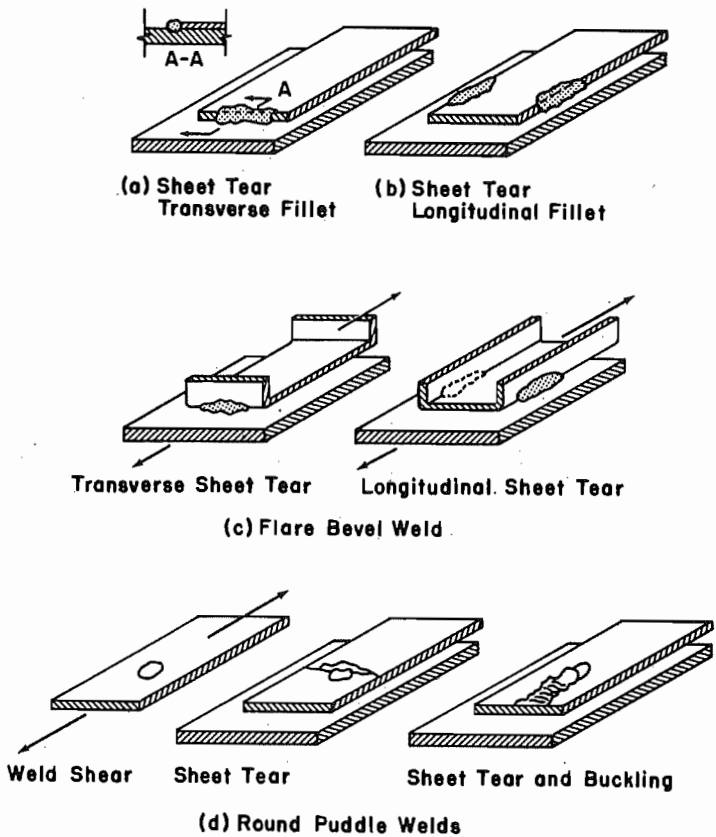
Typical Failure Modes of Welded Connections [Peköz and McGuire (1979)]
